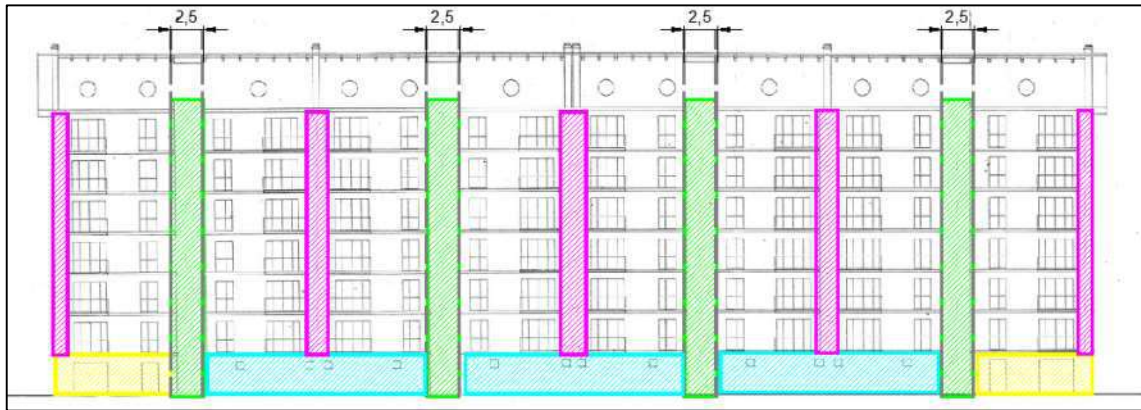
South Elevation: The porches are highlighted in yellow, the stairwells in green and the cellars in light blue. The walls surrounding the chimneys are highlighted in pink.
